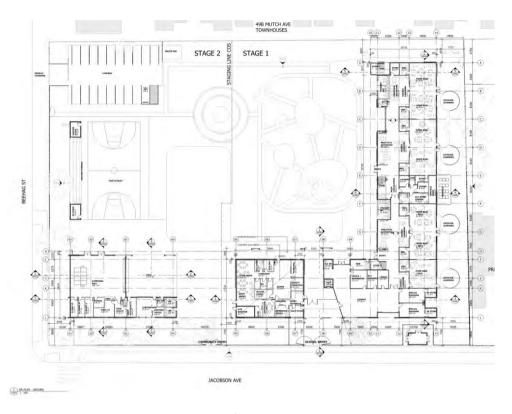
Overall Site Plan Showing Staging of Works
